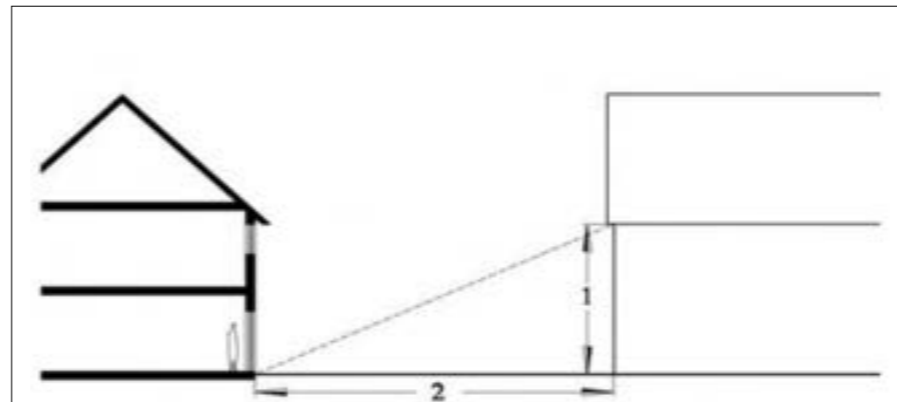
The distance between habitable room windows and a blank wall must be minimum 2 times of the height of the wall.
